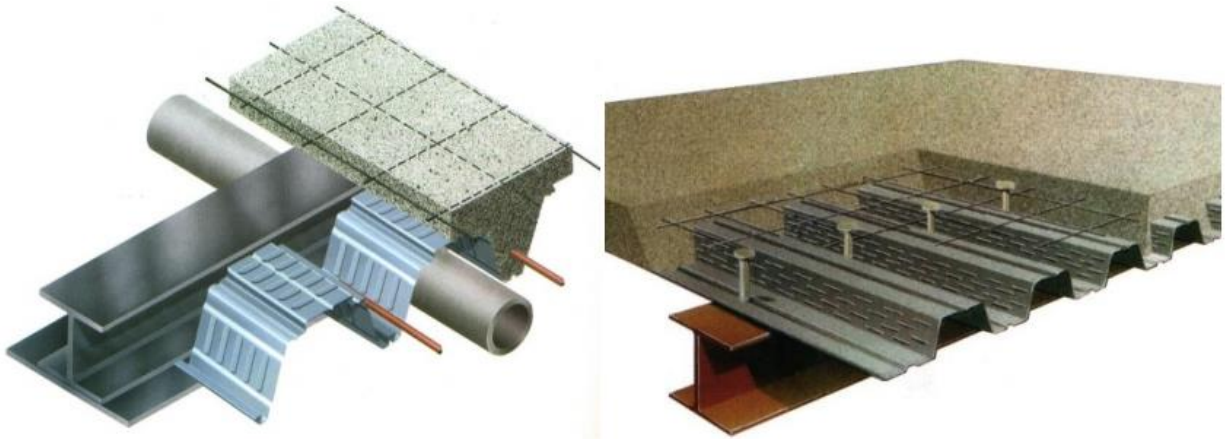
Composite steel concrete floors with sheeting and steel beams (Dubina et al., 2013)
